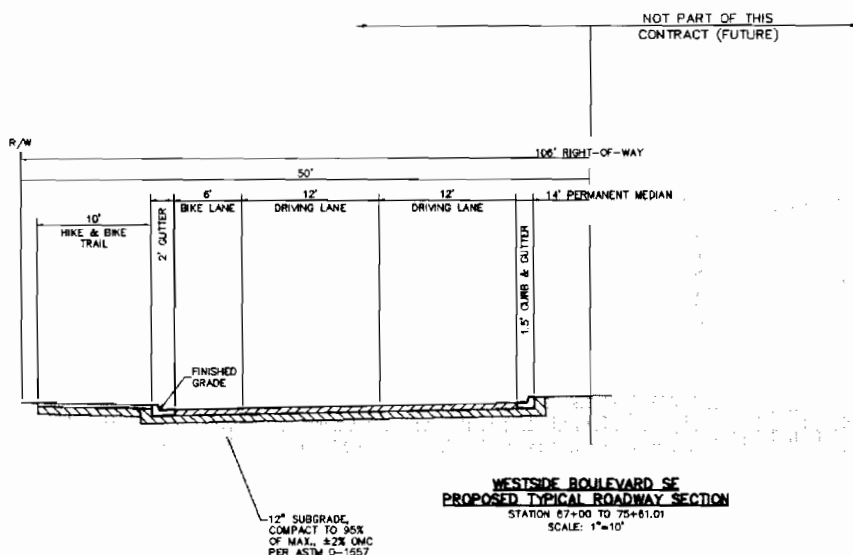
Westside Boulevard Preliminary Street Section employed for calculating land treatments
